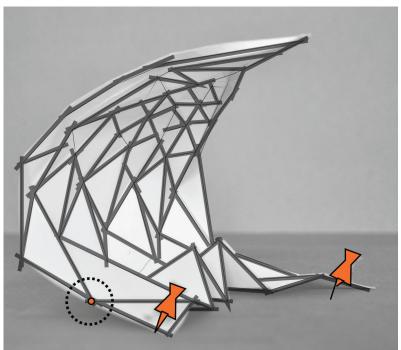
The second idea for building the deployable Shells, Deployable steel frame and rigid triangular sheets that are connected to the frame
